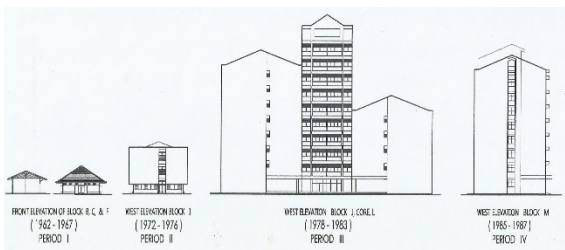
Timeline 1962-1987 Building Construction Facade on Campus I Universitas Tarumanagara
